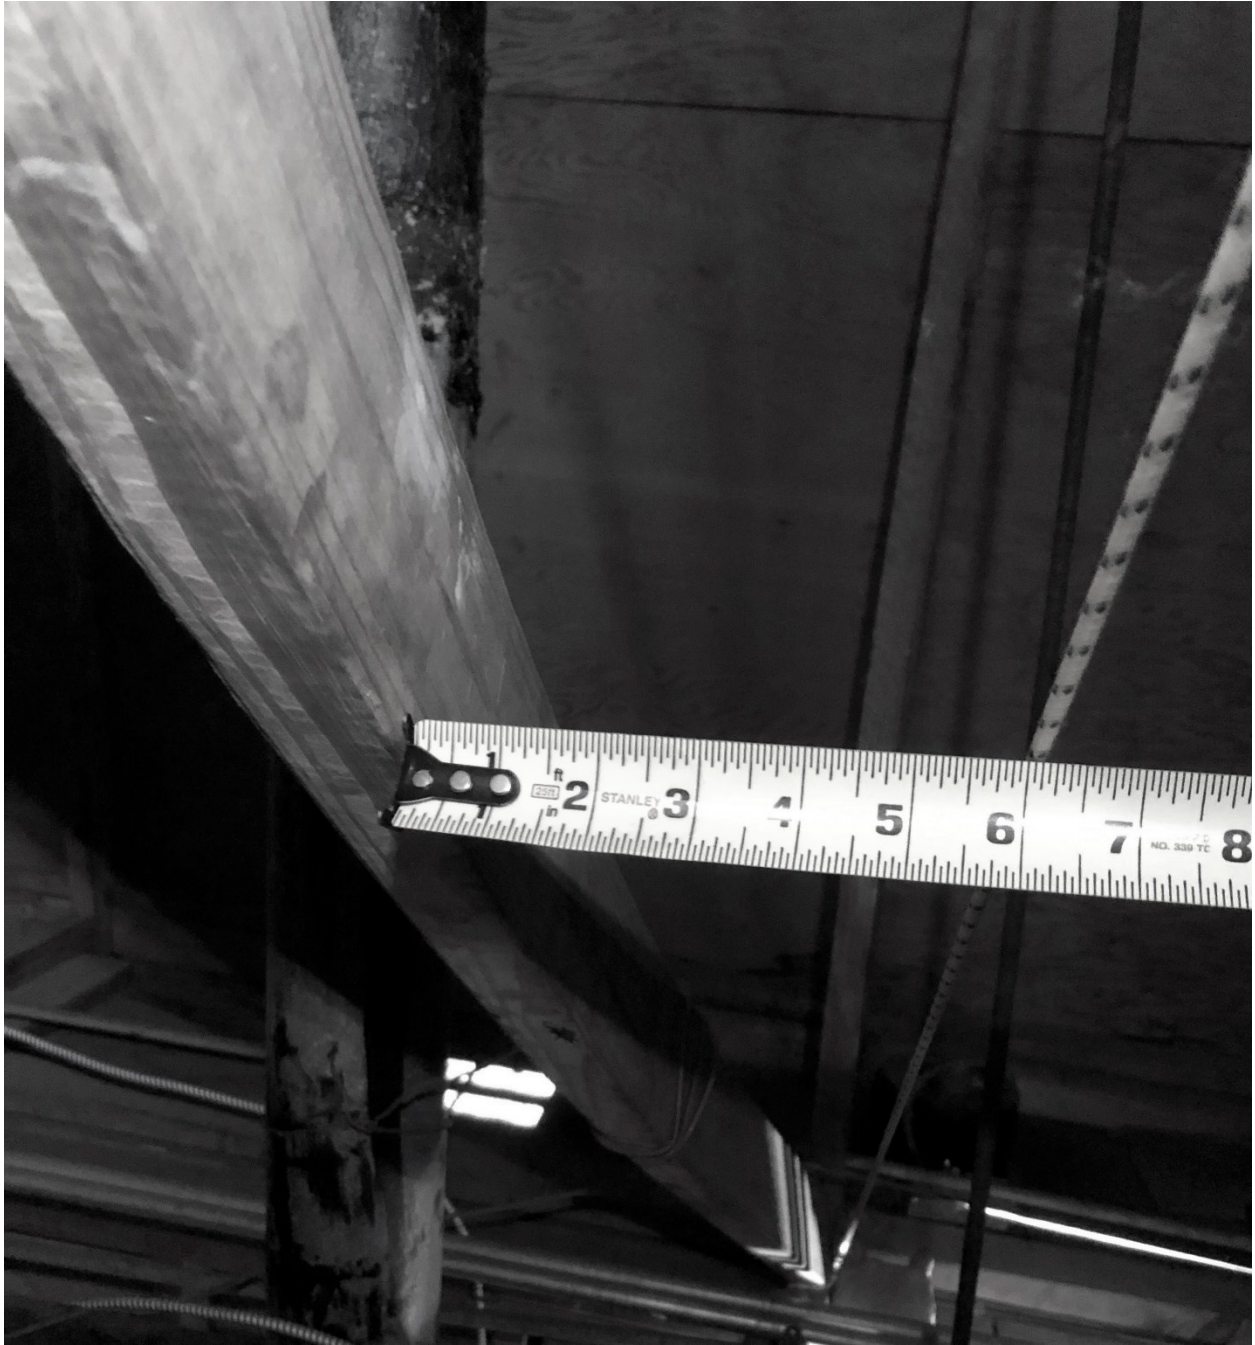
Exemplar web member showing 15.5 centimeters (6-1/8 inches) of deflection. The member is 2x4, #2 as called for in the truss diagram. Its unbraced length is 256.6 centimeters (101 inches). The truss had a little or no live loading at the time of the photograph.
